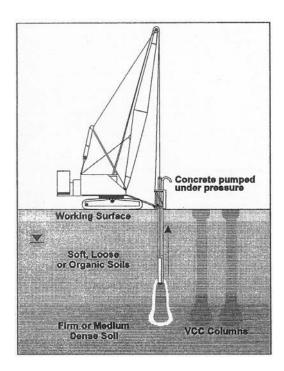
Vibro concrete column installation (Schaefer et al. 1997)
